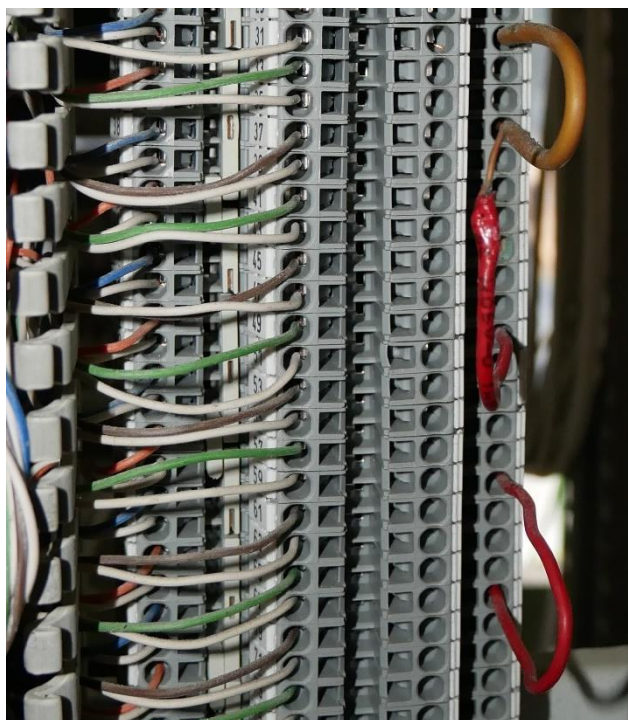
Incorrect connections on terminal block #7 with visible signs of overheating and melting.
